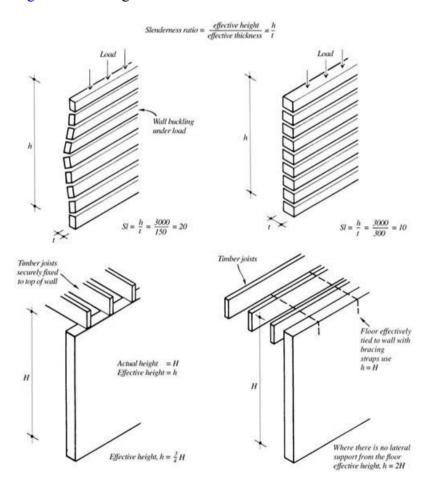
Slenderness ratio and lateral bracing in walls.
